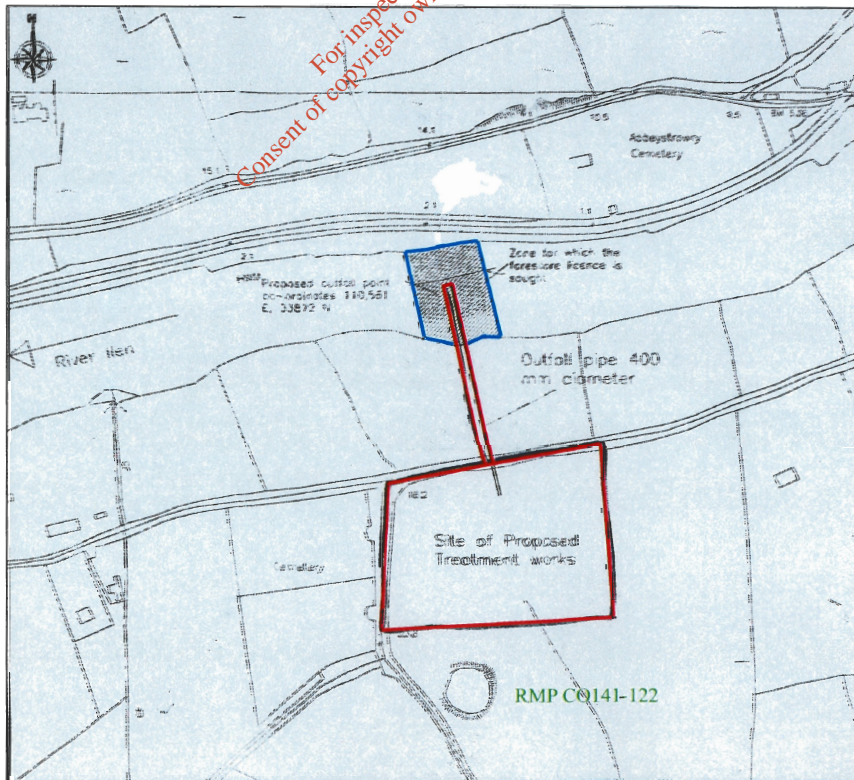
Proposed sewerage treatment works facility and outlet pipe extending into River Ilen.
